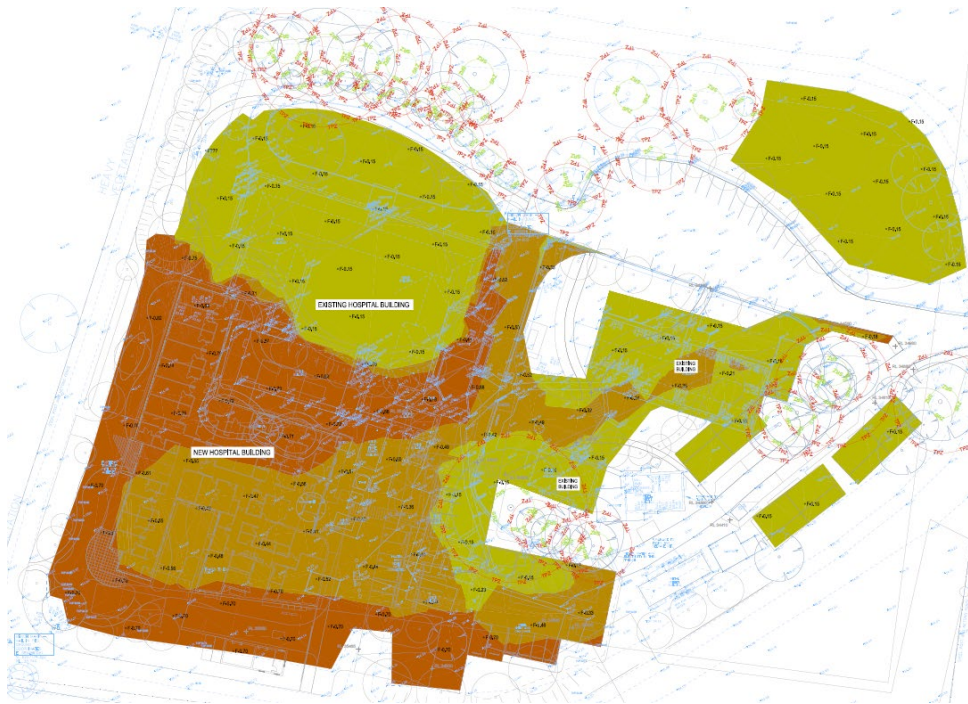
Cut Plan (Intermediate stage only) -1.3m -0.1m.
